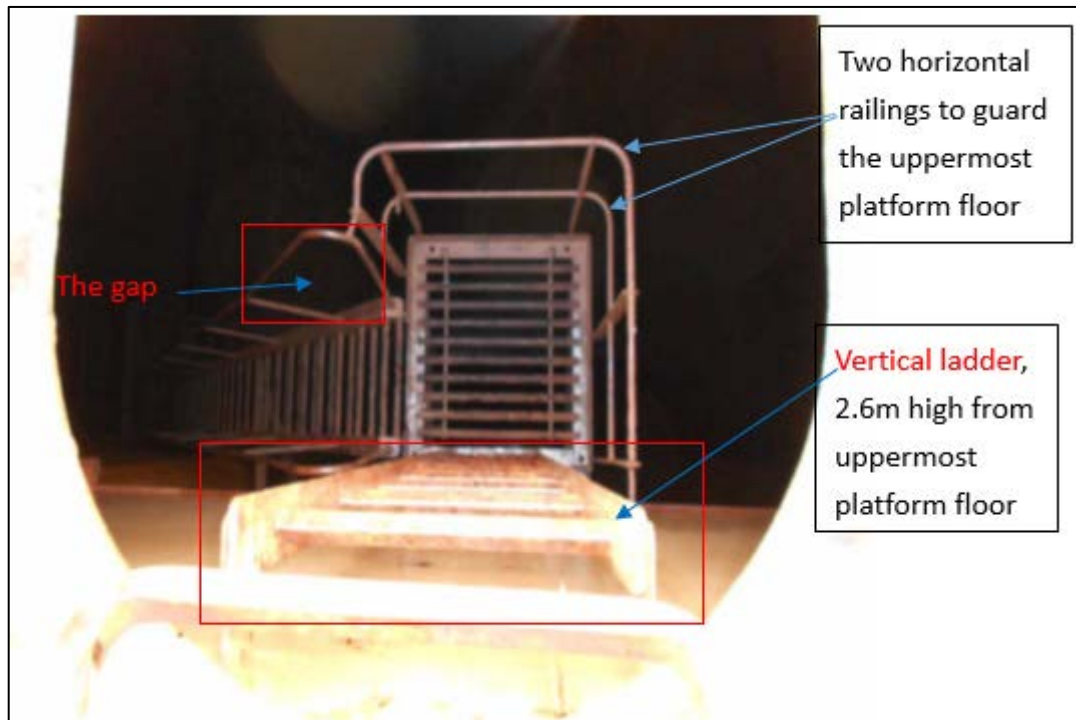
Viewing down from tank dome at the vertical ladder, uppermost platform floor and the inclined ladder.
